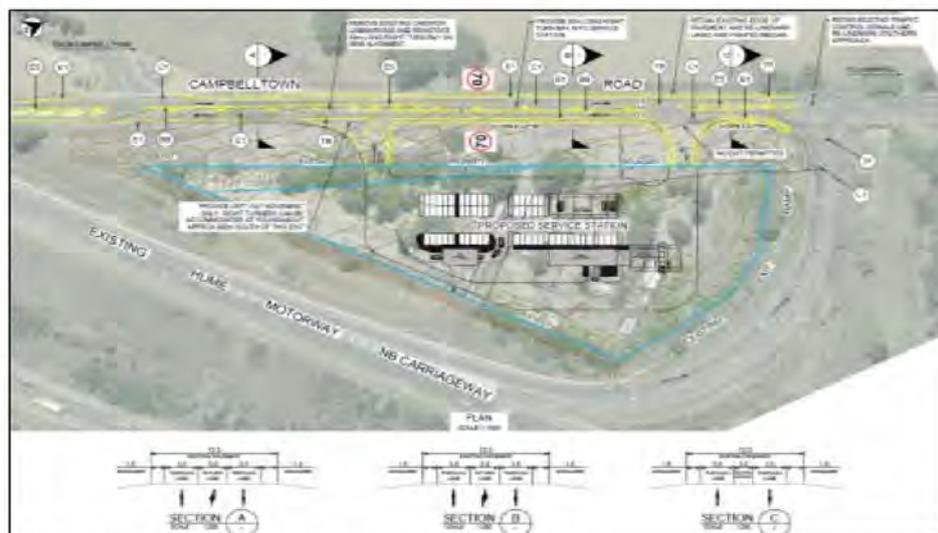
Concept Layout Site Plan. Source - J. Wyndham Prince
